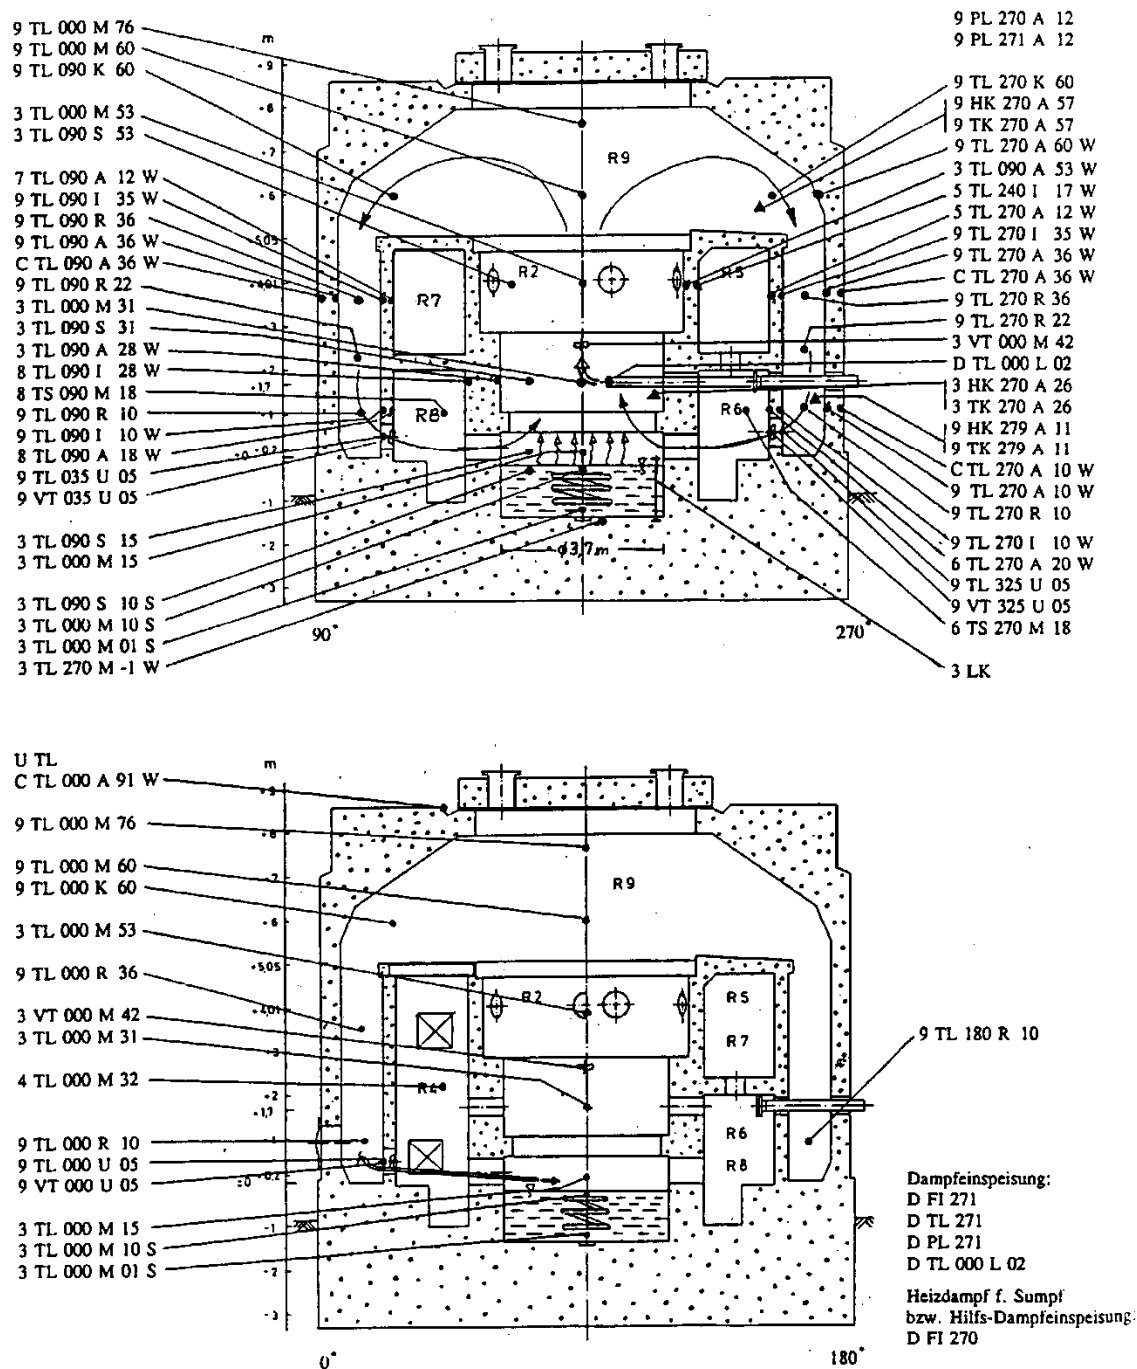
C-47. Instrumentation Plan for BMC – Sump Heatup Test RX4
